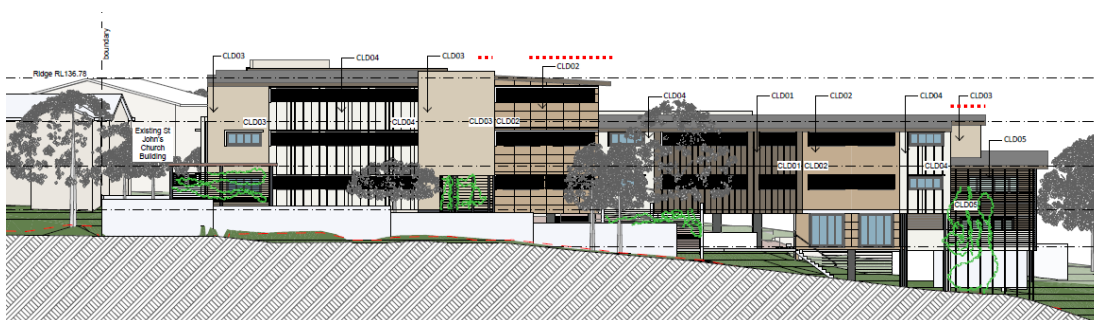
Western elevation of the proposed development showing the extent of the roofline which results in breaching the height standard (identified in red) Source: Architectural Plans Elevation Architecture
